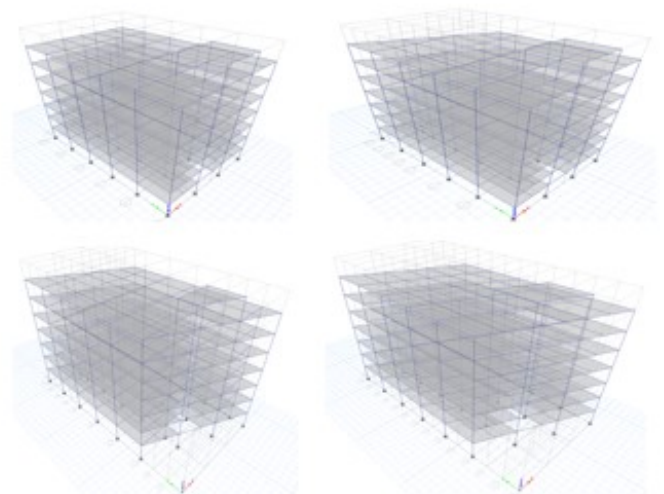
Typical floor plan of M1, M2, M3 and M4 models
